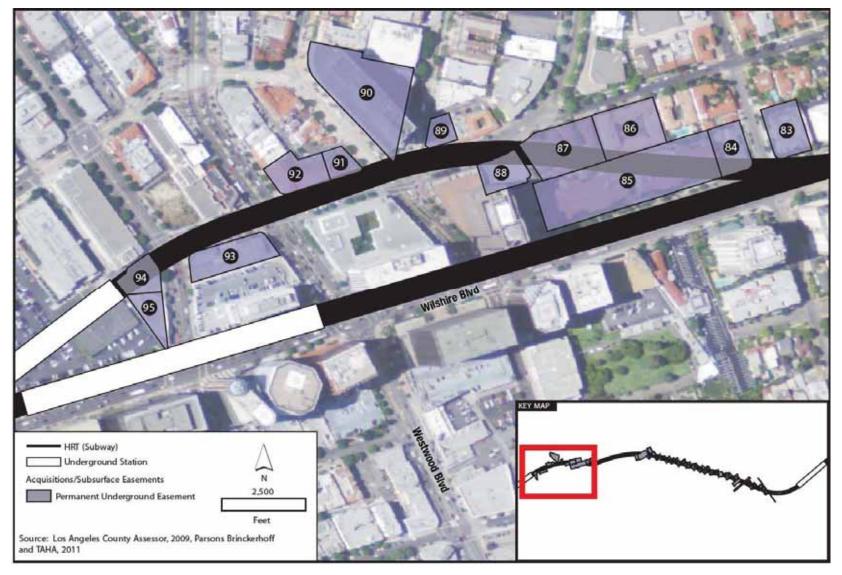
Permanent Underground Easements from Century City Constellation Station to Westwood/UCLA Off-Street Station Only
